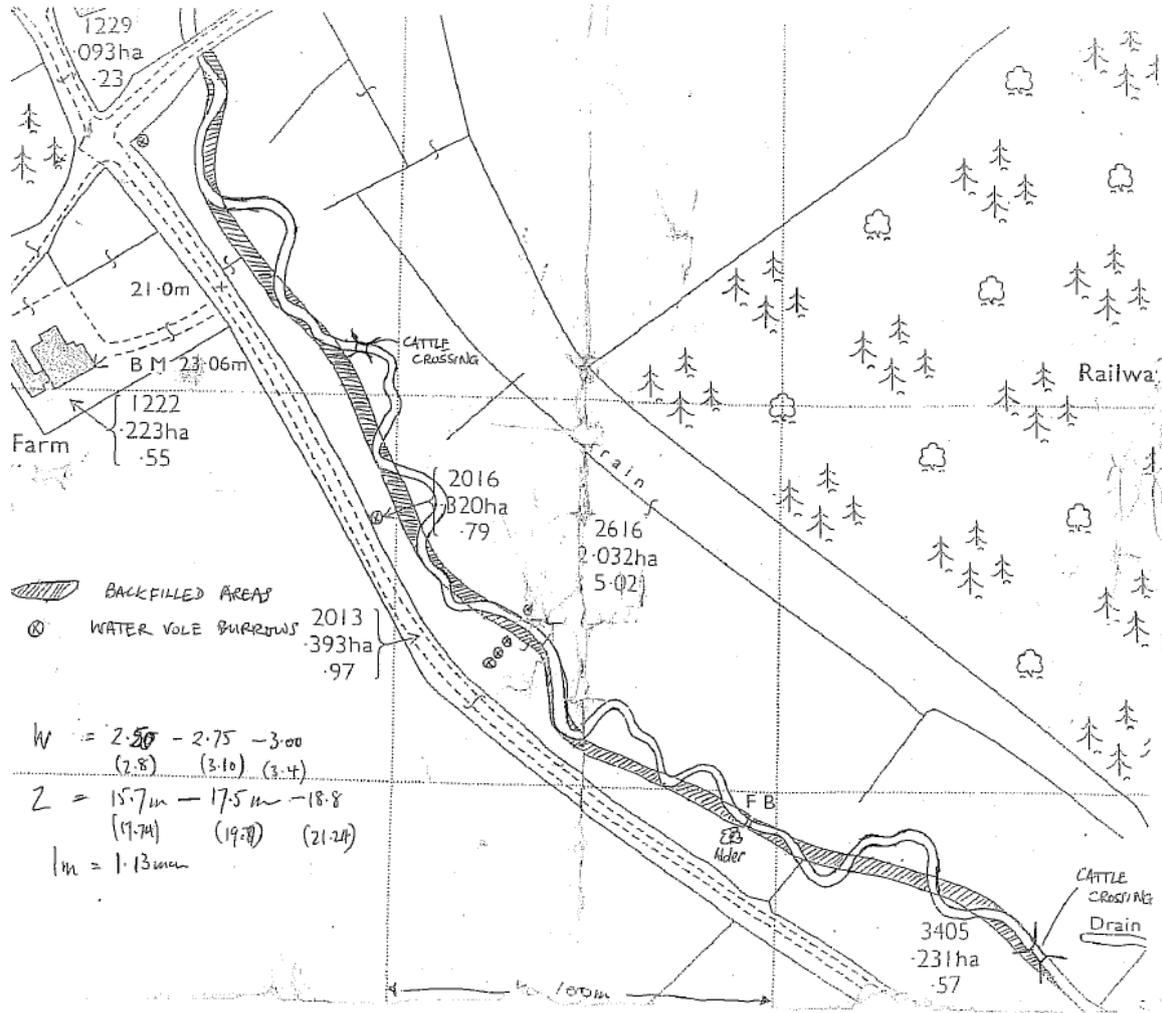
Plan of river re-naturalisation project carried out on River Glaven, Hunworth, Norfolk. The shaded line is the original engineered channel, the open line is the new, restored course. The engineered channel was back-filled with spoil excavated from the new channel (River flowing SE to NW) and large quantities of spoil removed from site to lower the floodplain.
